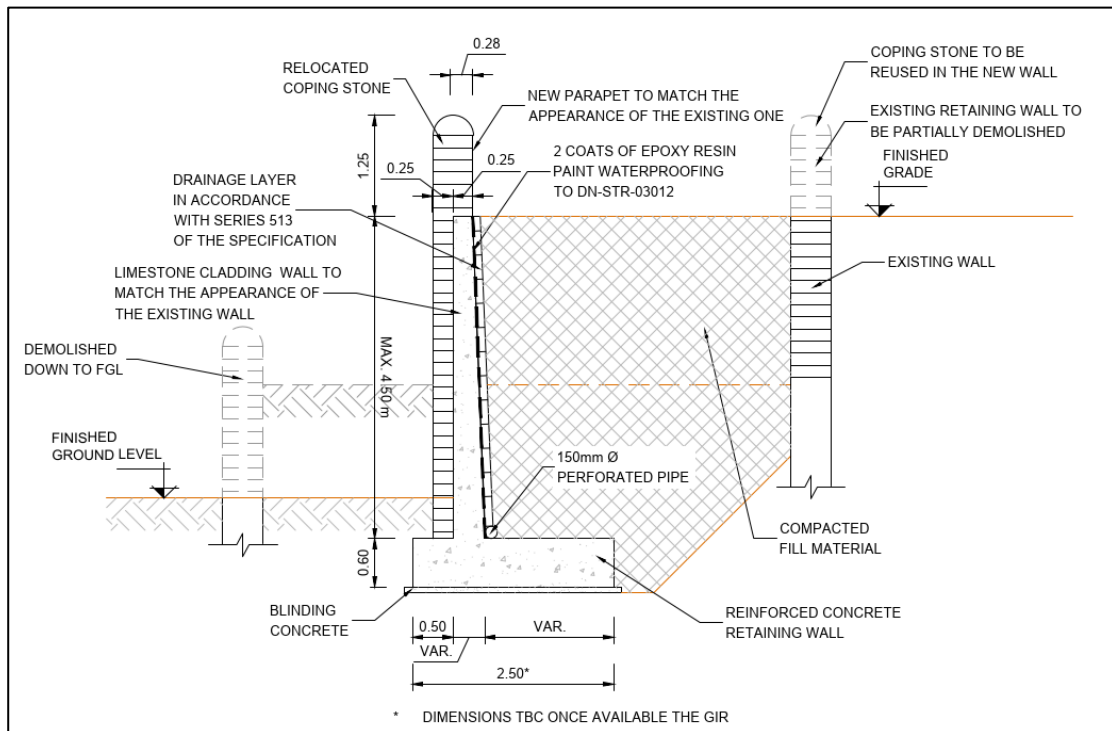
Kimmage 03 – Typical Cross Section of Retaining Wall
